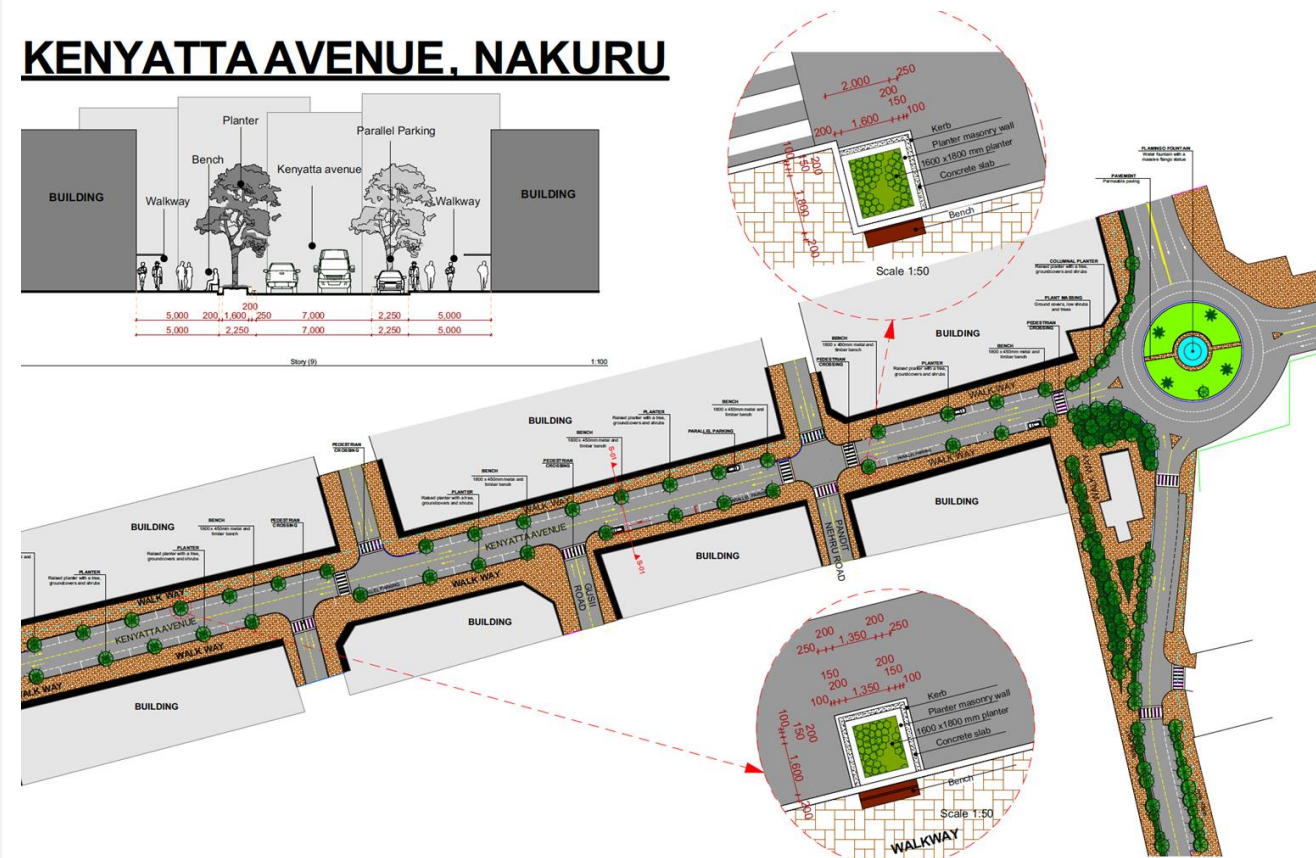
Layout of the Kenyatta Avenue street tree planters
